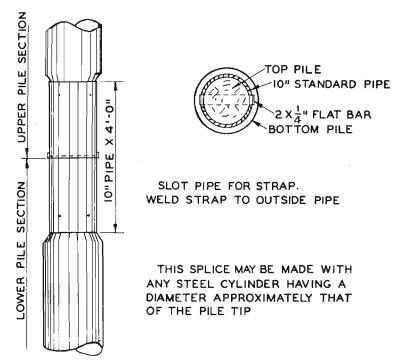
Timber-pile splice using steel line-pipe for a sleeve joint.
